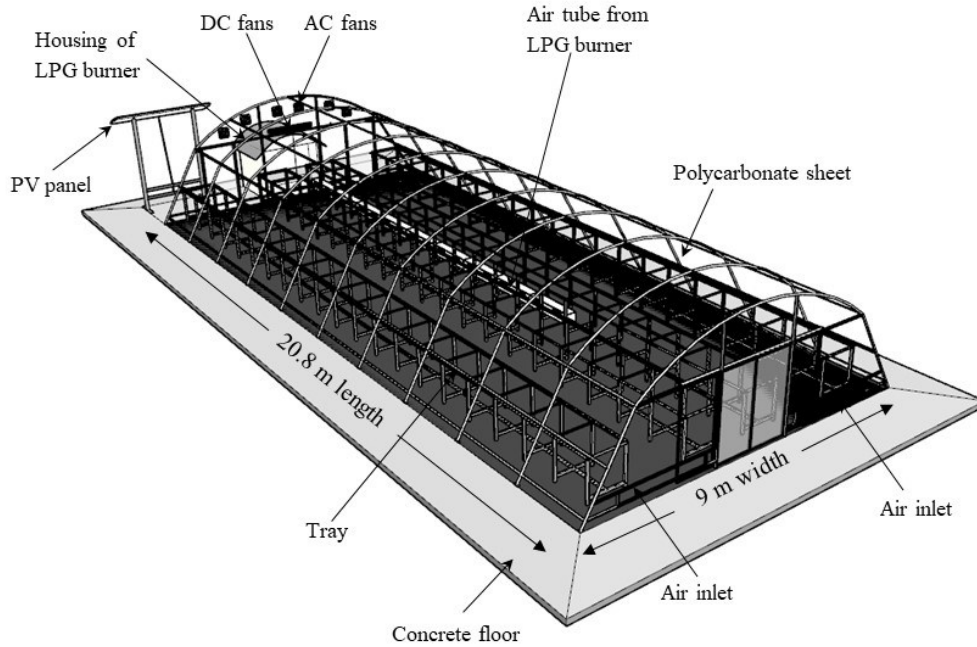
Structure of the large-scale greenhouse type solar dryer.
